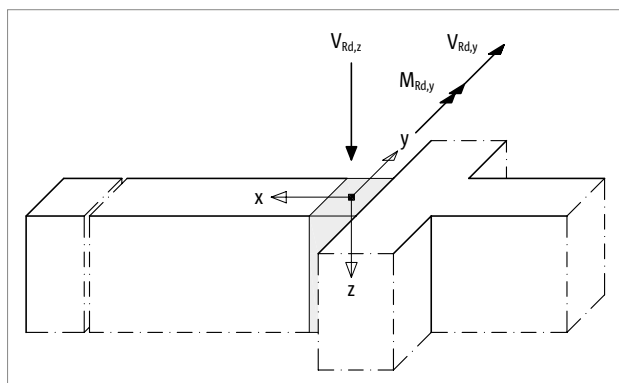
Schöck Isokorb® T type W: Sign rule for the design
